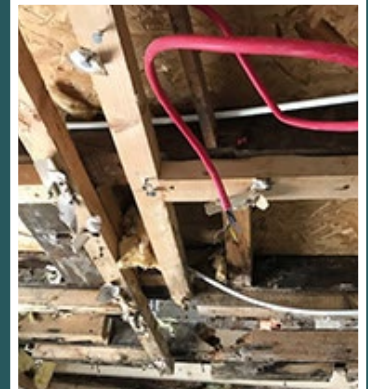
Rotted floor joists from underneath the same room shown in photo 12
